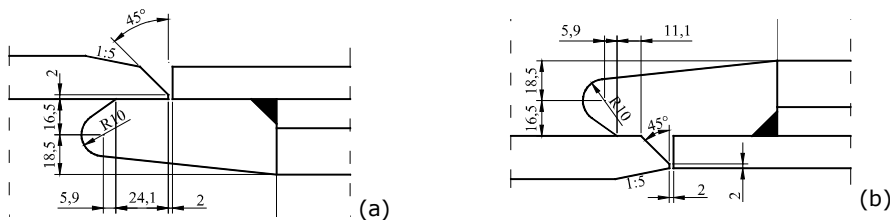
Preparation details for full penetration welds between external diaphragm and top cover plate (a), and bottom cover plate (b)
